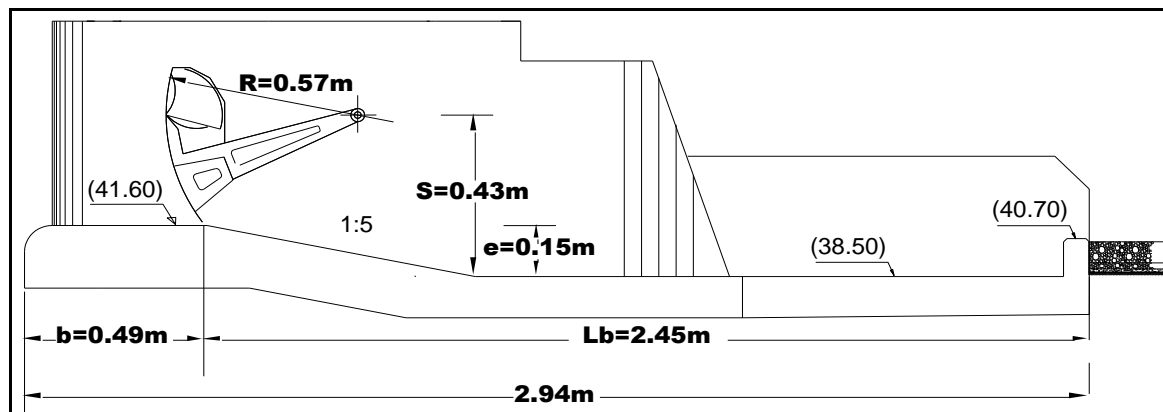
Sluiceway stilling basin with linear slope and raised apron
